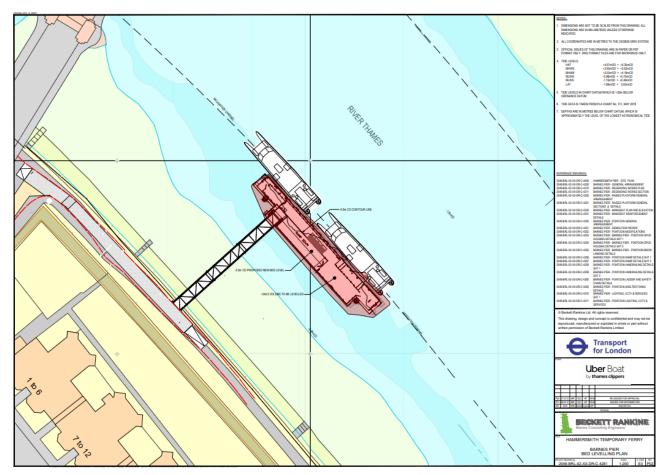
Location of sediment to be levelled via plough dredger at Barnes Temporary Pier Source: Beckett Rankine, 2048-BRL-02-XX-DR-C-4281 P02 BARNES - BED LEVELLING PLAN
